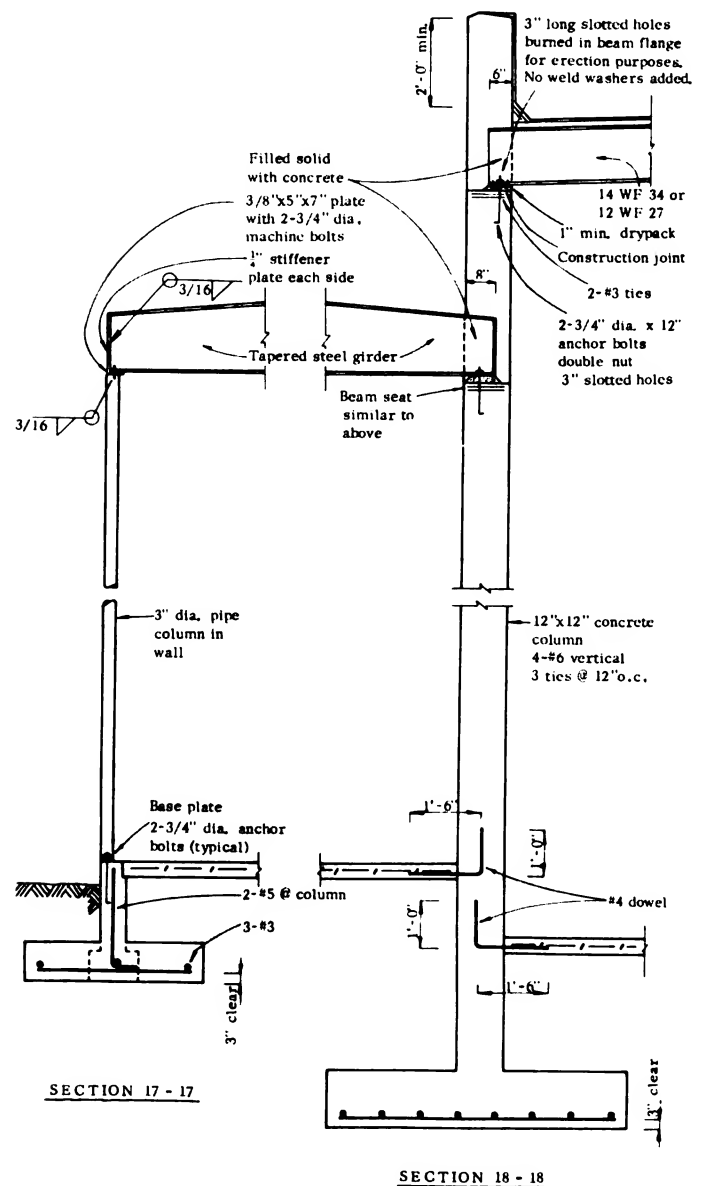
Alpha Beta Market. Sections 17-17 and 18-18.
